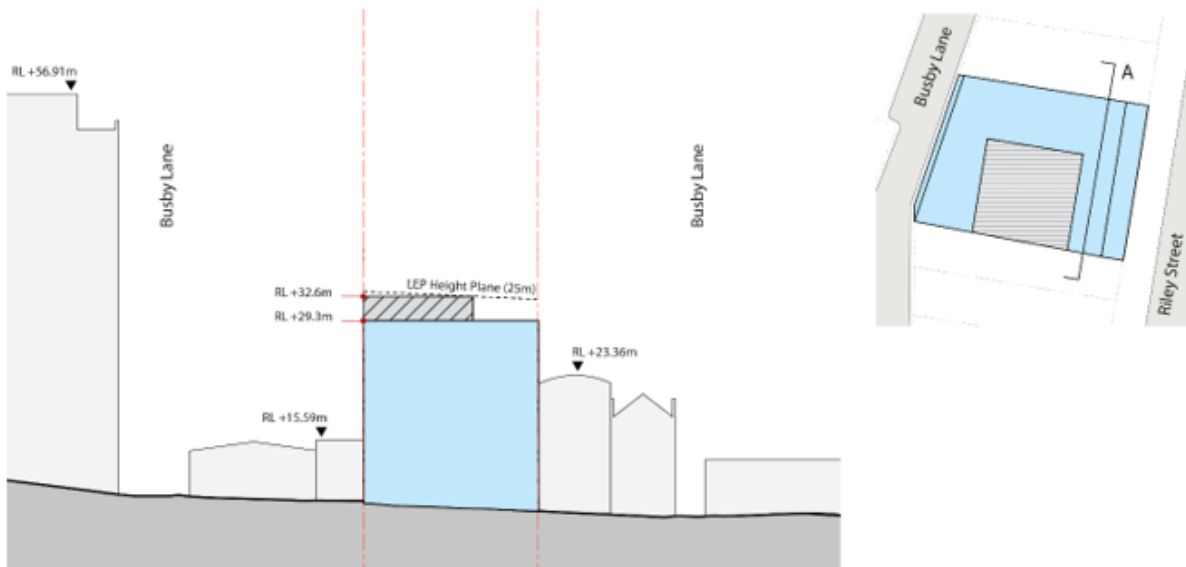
Maximum Building Envelope Section A (hatched area represents an allowance for roof top structures under the LEP Height control)
